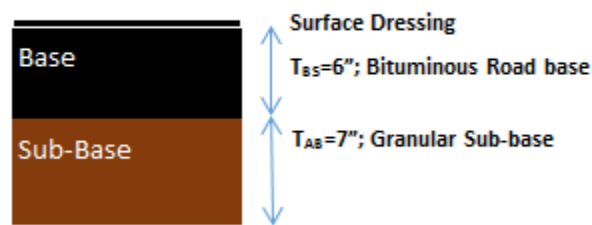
Proposed road section for CSAH 10 using Rolt's method
